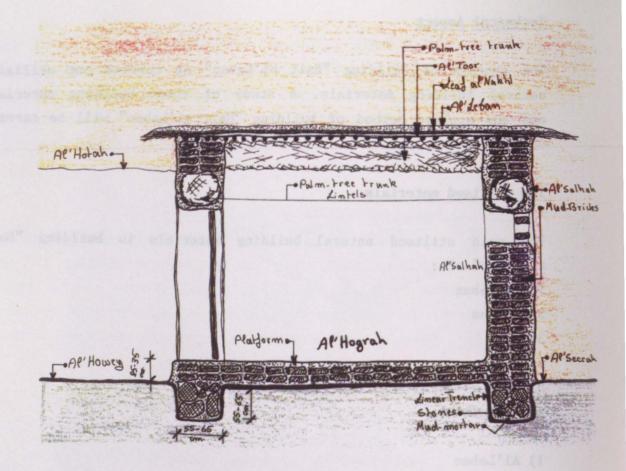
A sketch that shows a transversal section passing through "Bait al'Leban".
